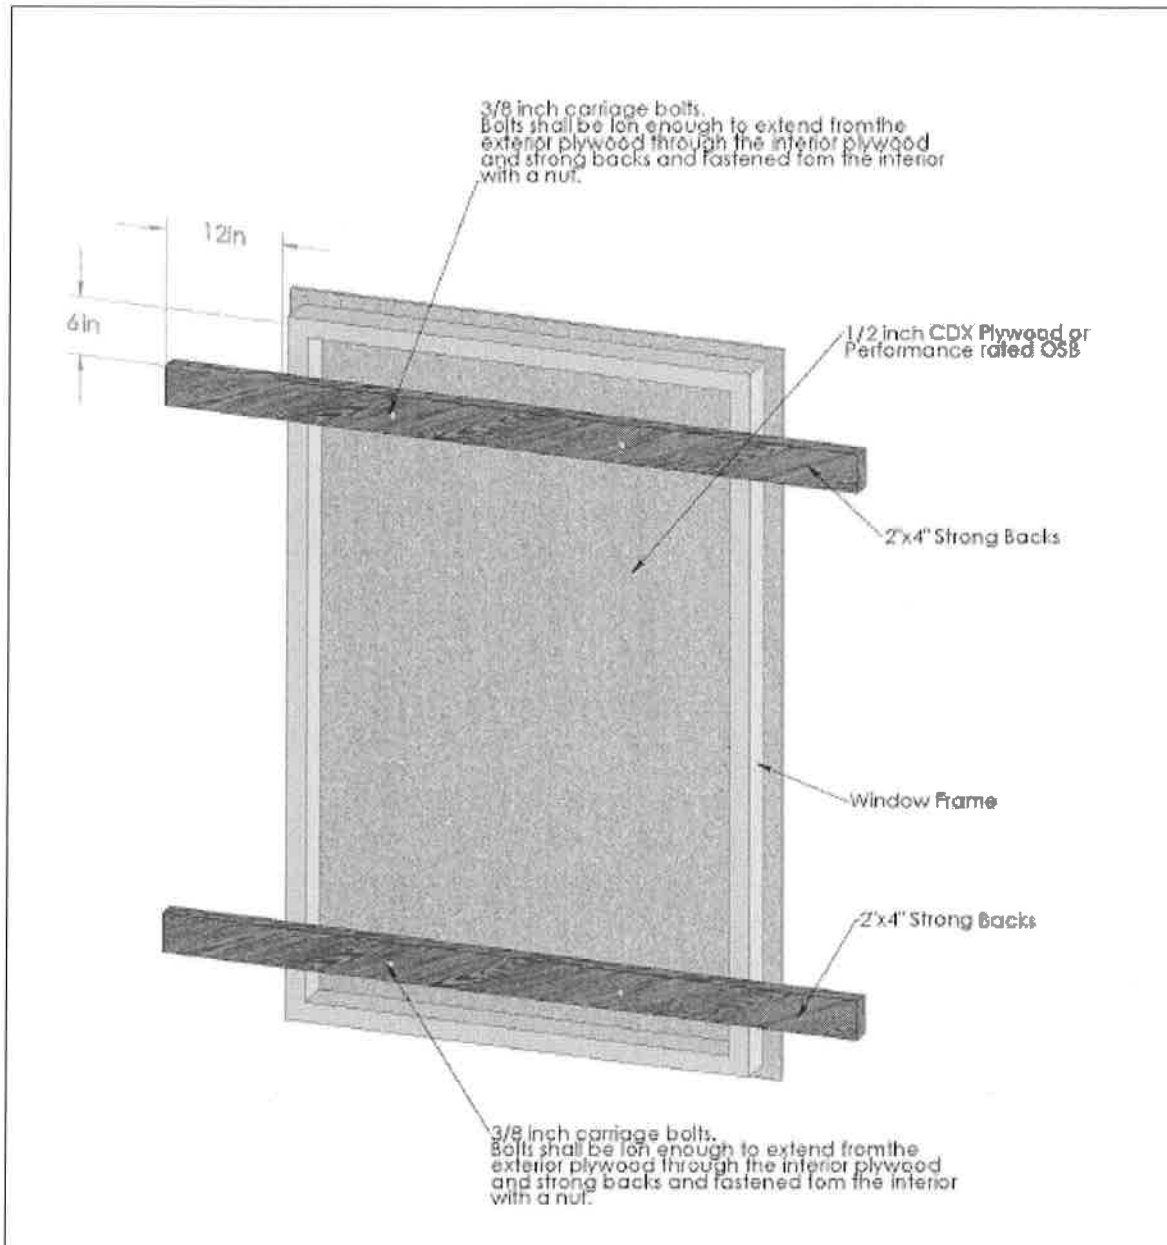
(1) BOARDING OF DOOR OR WINDOW
